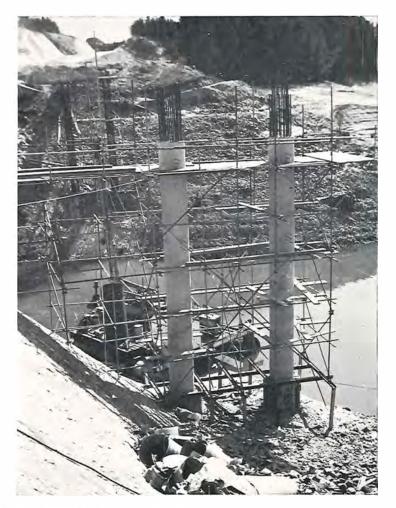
Pykes Creek Reservoir Bridges Duplication. Outer Main Piers Under Construction.
